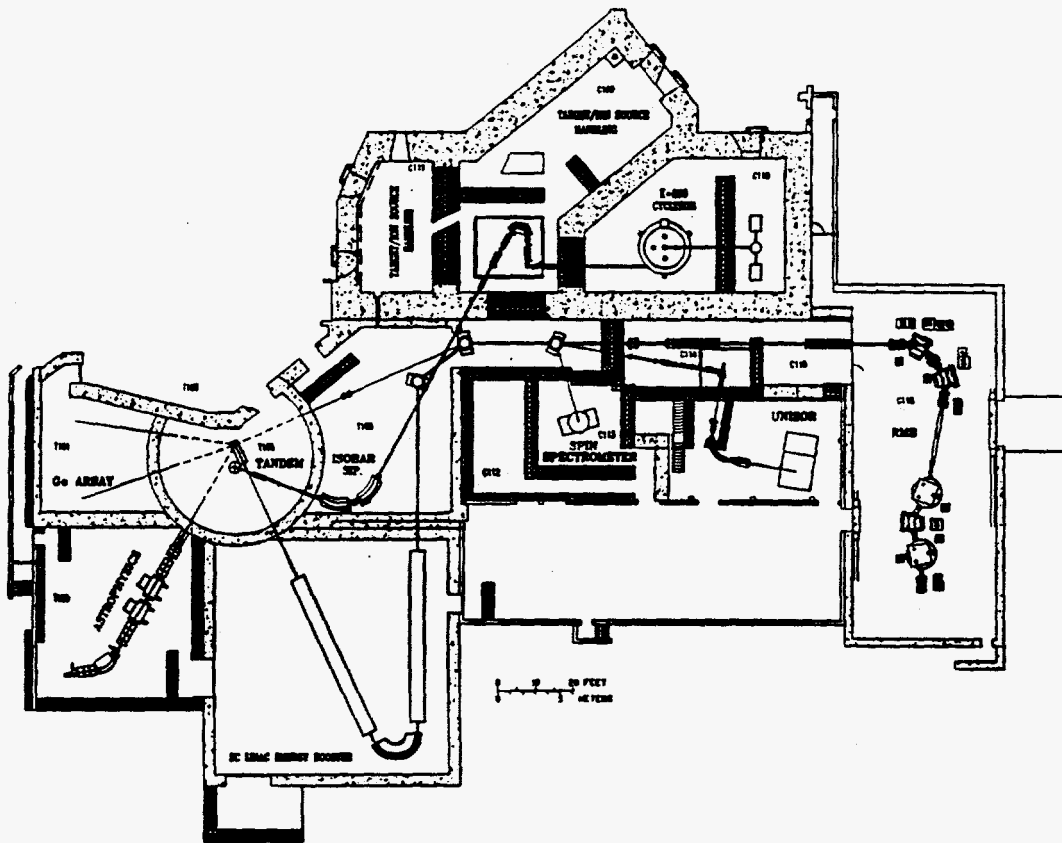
Upgraded HRIBF Building First Floor Plan and Proposed Alternate Placement of the Target Room (Room C109).
